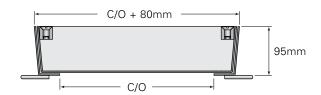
XPAVE 95 Galvanised Steel Dimensions
